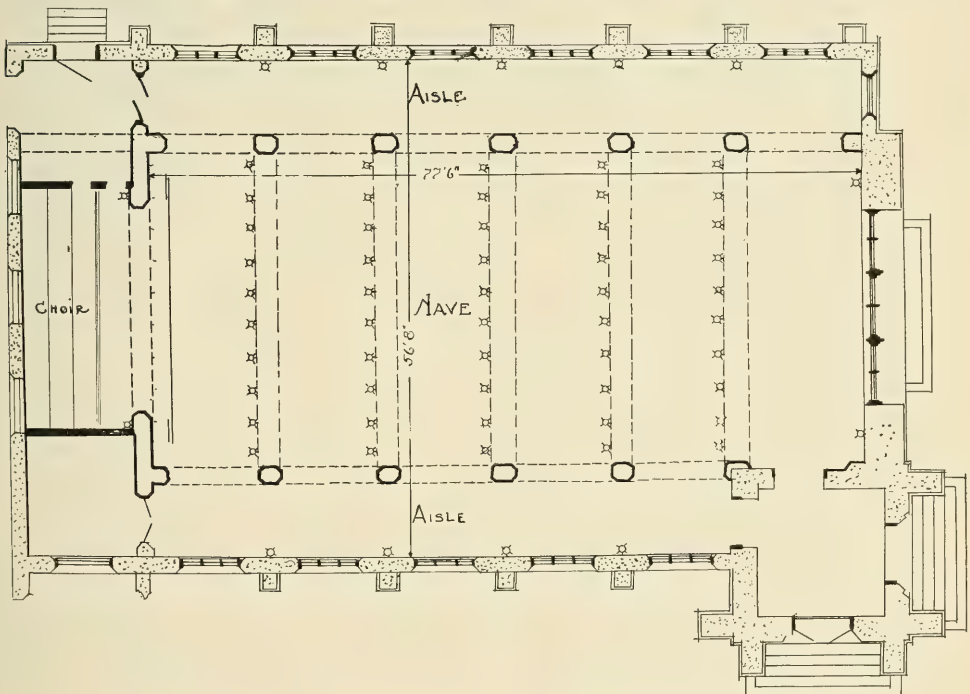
FLOOR PLAN, SHOWING ARRANGEMENT OF UNITS.
